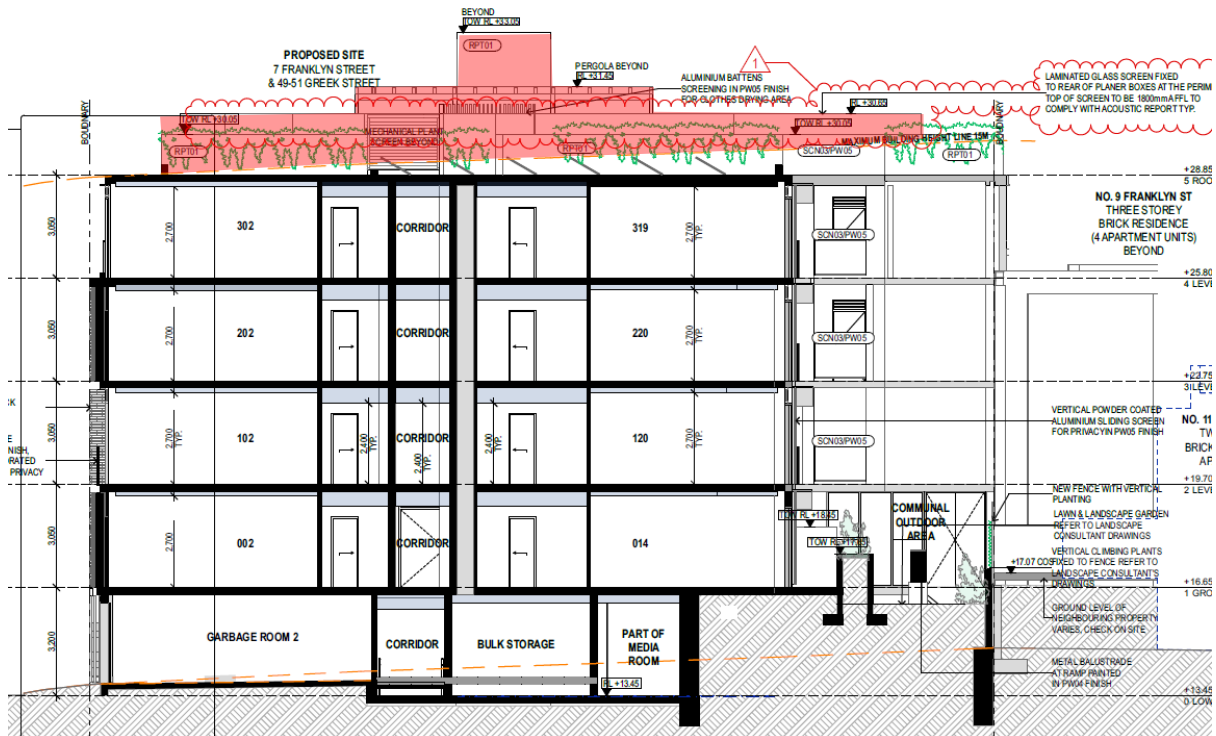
Section plan north-south showing the 15m height plane diagram in red, with those elements above the height limit shaded in red
